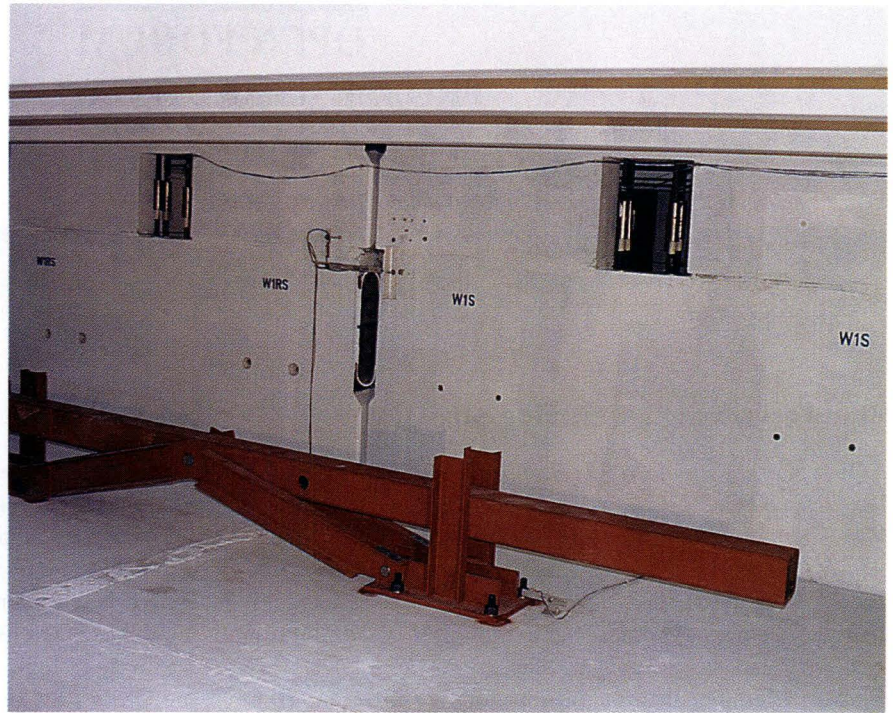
Jointed shear wall showing U-shaped flexural plate.
